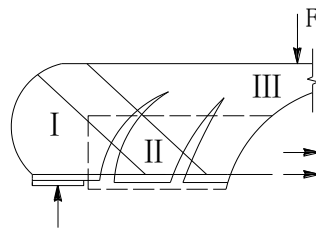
Mechanical model of box girder after diagonal cracks appear
